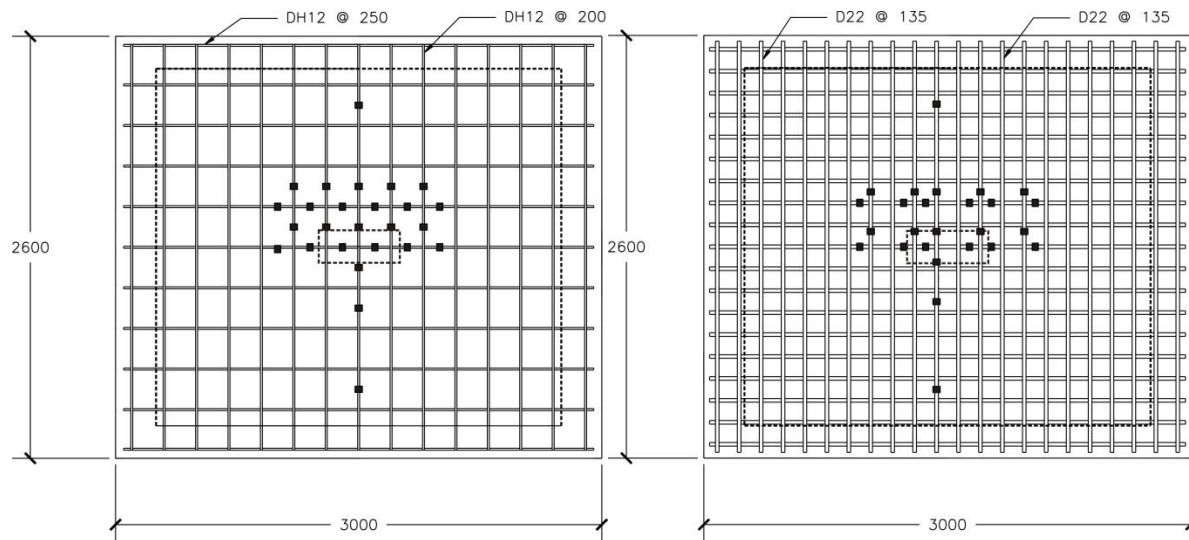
Strain gauge layout for steel (left) and GFRP (right) reinforced slab. Note: Only bottom bars shown. Dotted lines show position of load (inner) and supports (outer).
